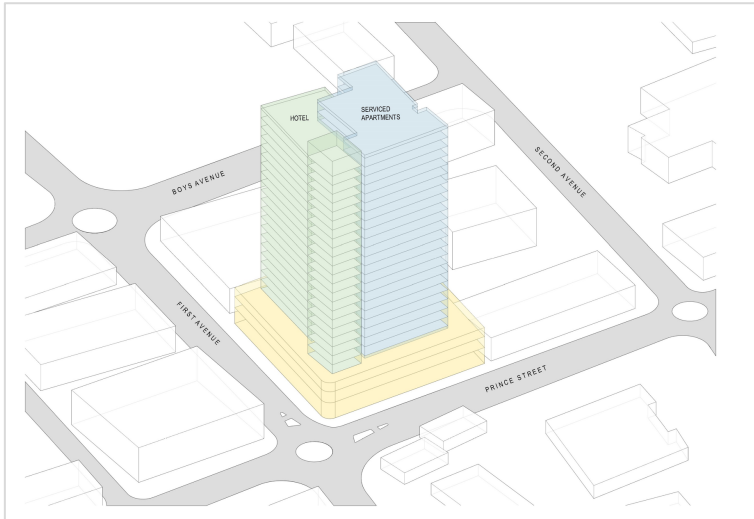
Proposed built form at 17-21 First Avenue, Blacktown
